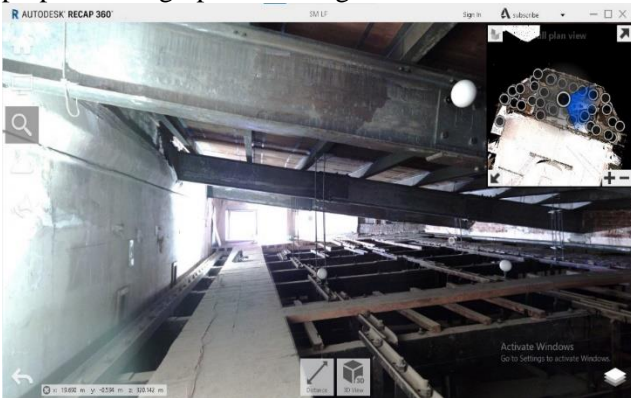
HBIM Model showing ceiling details after adding new roof structure
